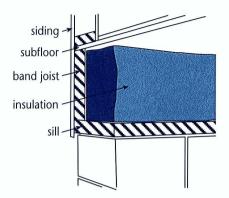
Cut insulation to fit band joist between the sill and subfloor.
